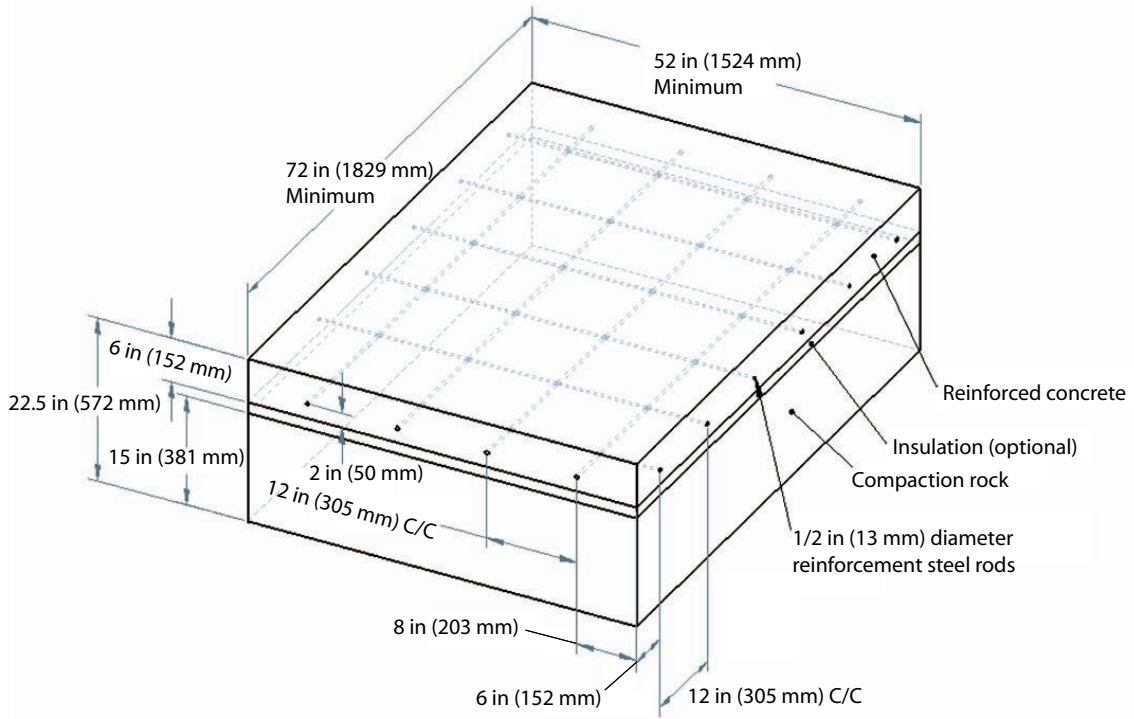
illustrates the concrete slab detail for a typical outdoor application.
